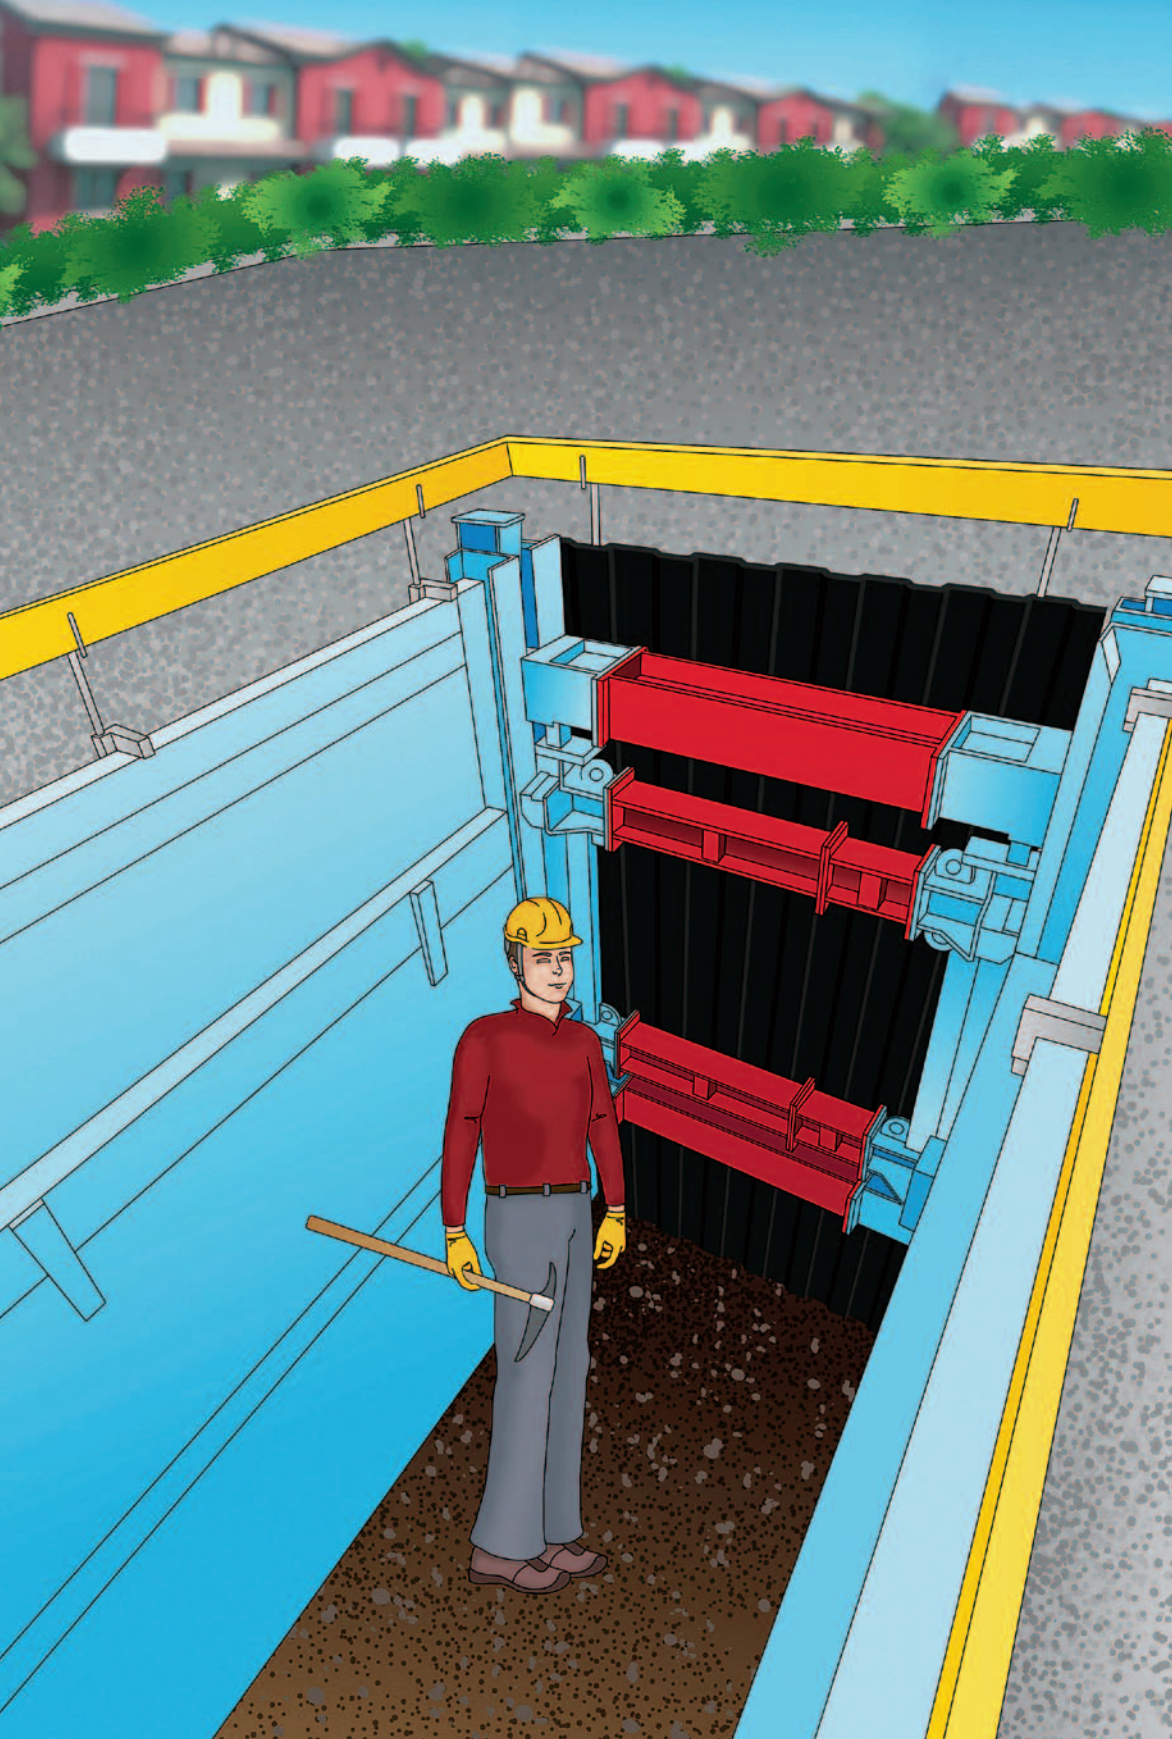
System made of metallic prefabricated components. Trench lining system endsupported with adjustable struts (UNI EN 13331-1)
